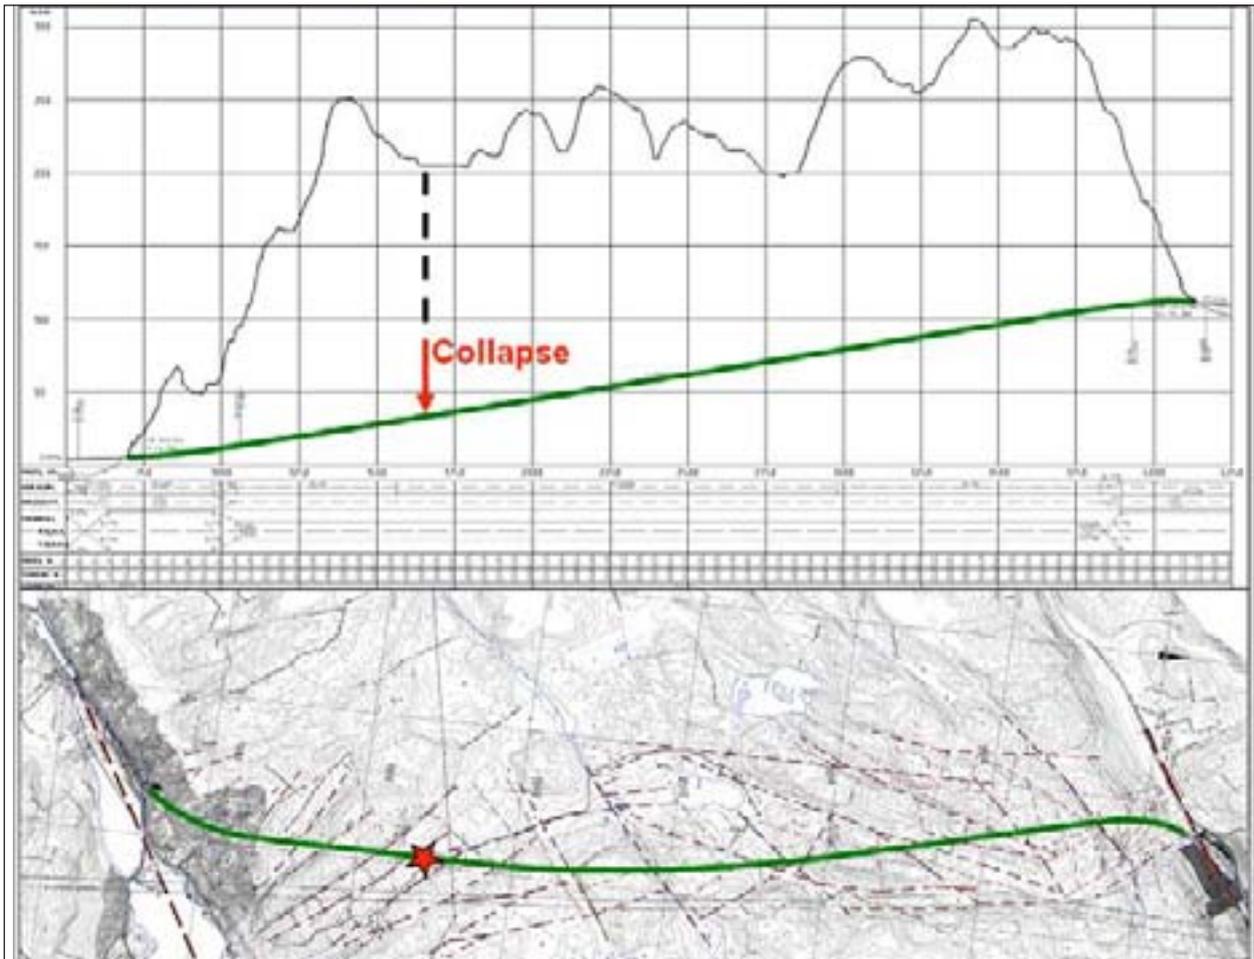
Plan and longitudinal profile of the Ravnehei Tunnel. The major weakness zones are indicated in plan view in broken lines. The collapse zone is marked with a star.
